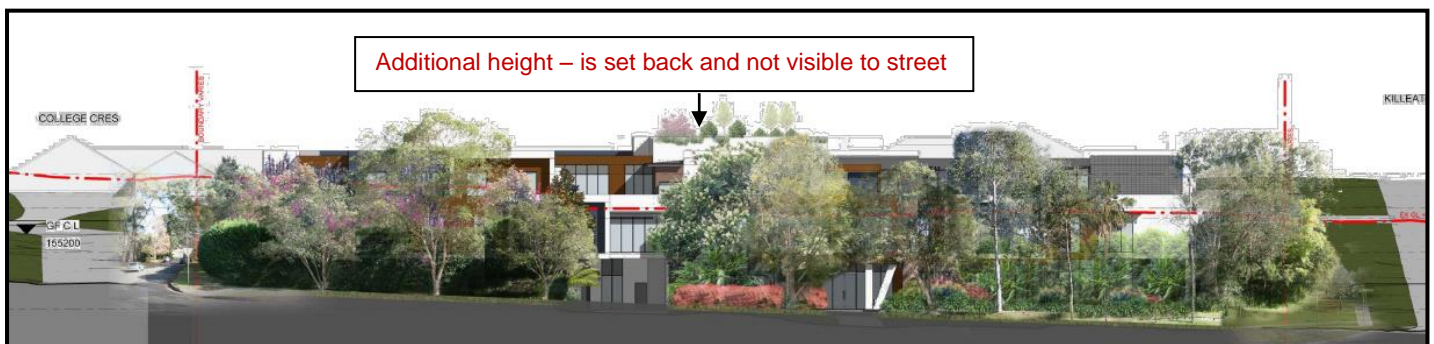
Yarrabung Road street elevation (with existing trees and proposed plantings)
